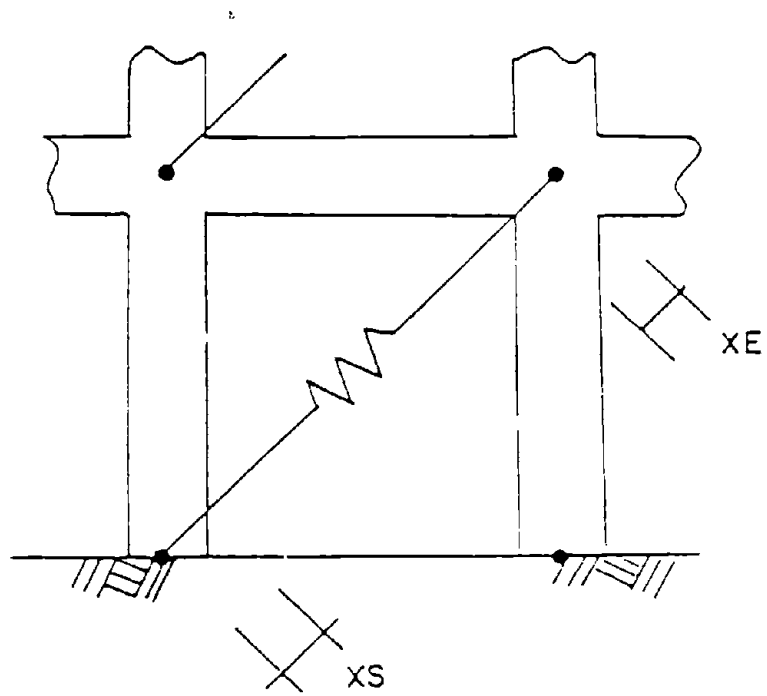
Diagonal Bracing Member Modeled with an Axial Spring
